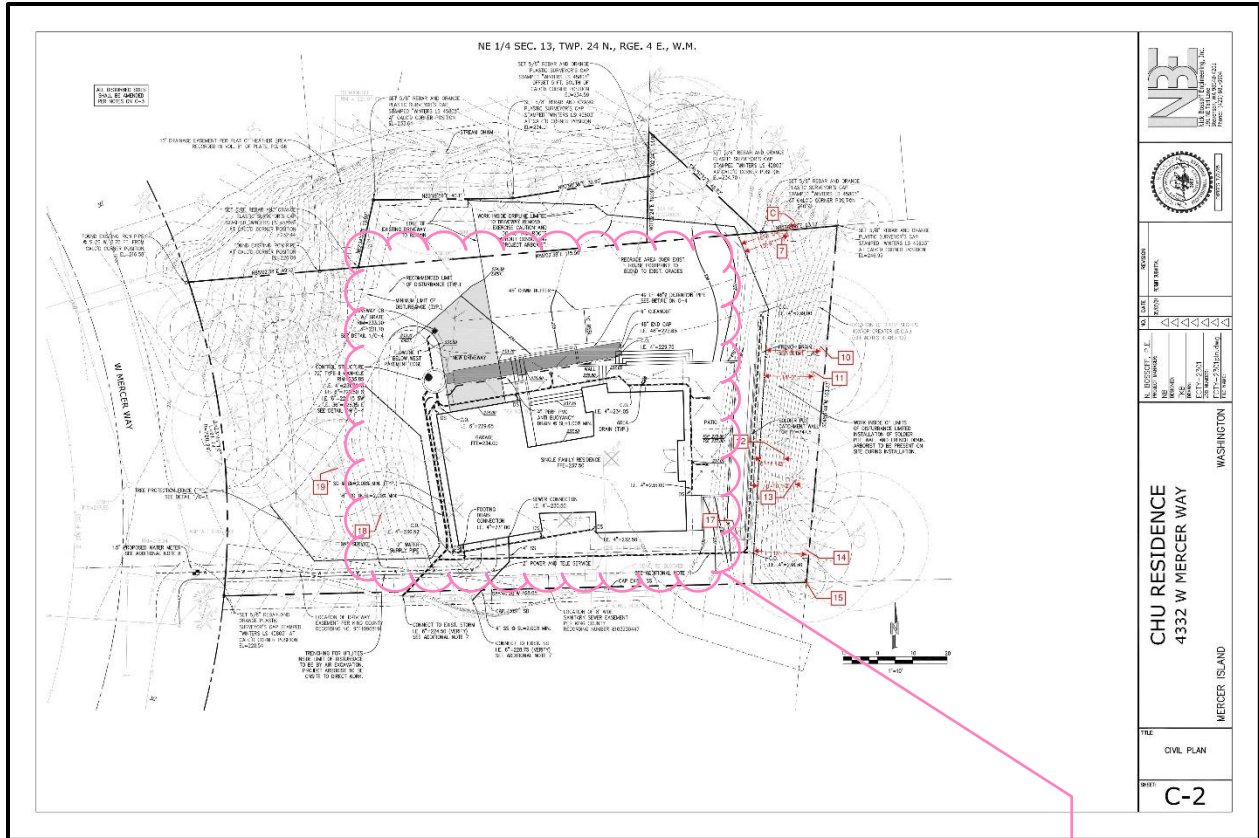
Civil Plan Sheet C-2 (Nick Bossoff Engineering, 05/07/2024)
